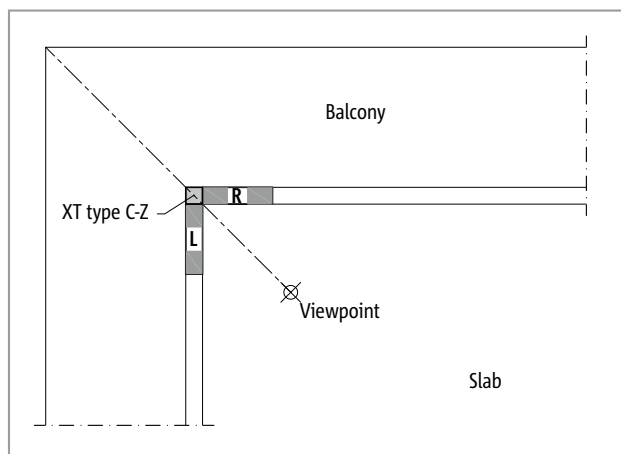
Schöck Isokorb® XT type C: Arrangement XT type C-L left from viewpoint, arrangement XT type C-R right from viewpoint
